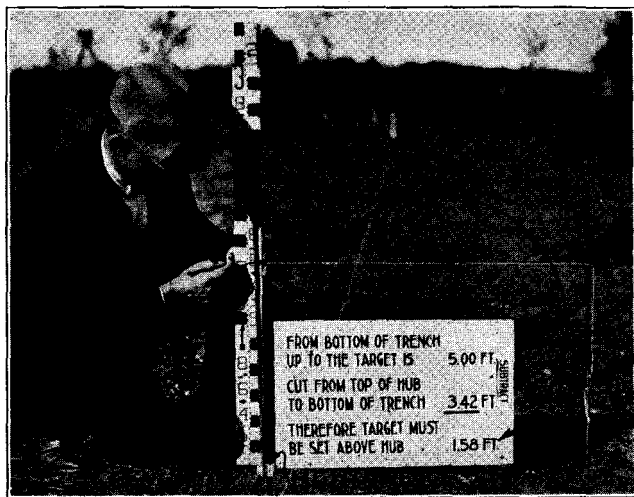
Setting a White String Target 5 Feet Above Proposed Bottom of Trench
